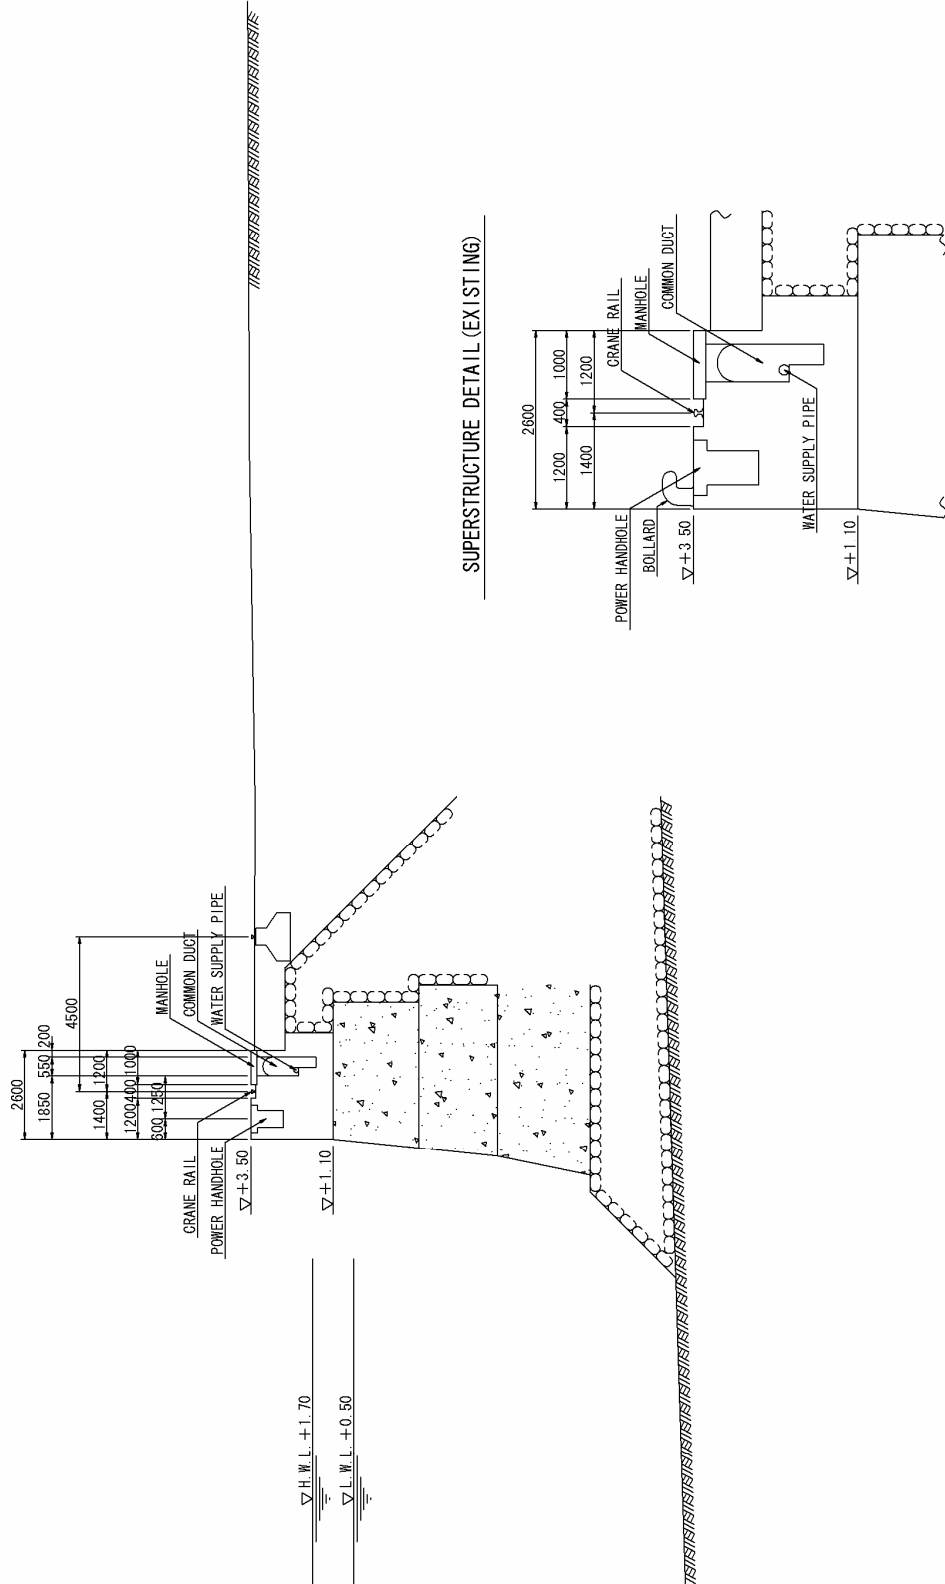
(16) Existing Typical cross Section in Port of Namibe
